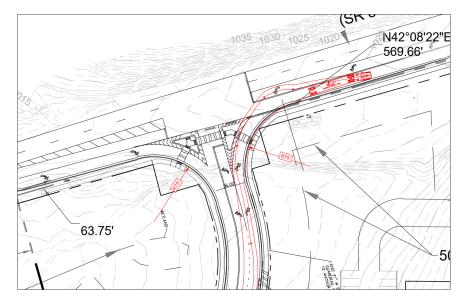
Winder Highway (SR 8/US 29) at Stanley Road – Northbound Right (Exiting Truck)
